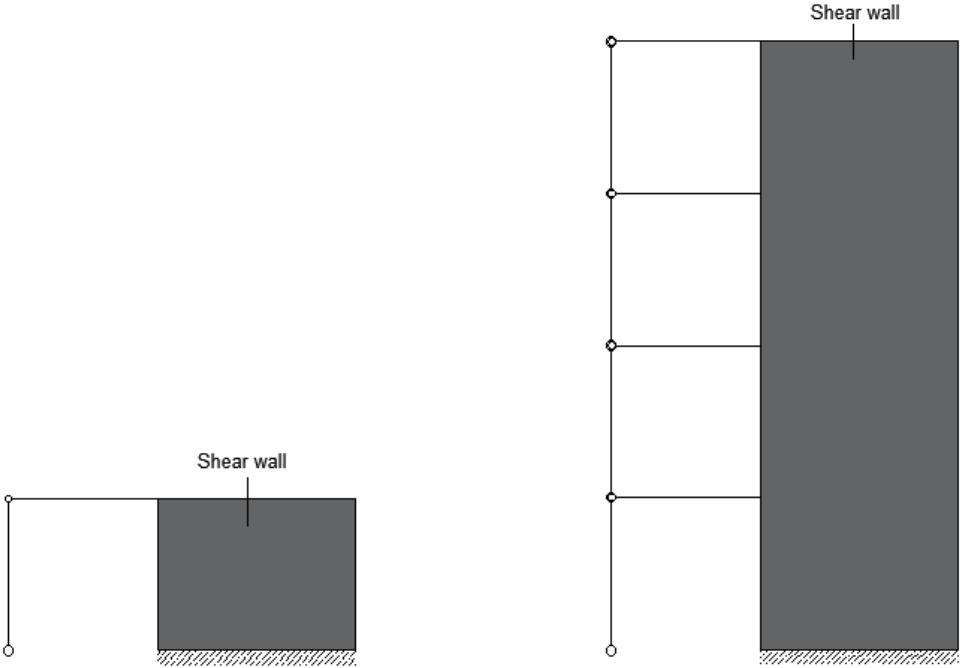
Left: Shear wall considered as cantilever wall, Right: Shear wall considered as cantilever beam.
